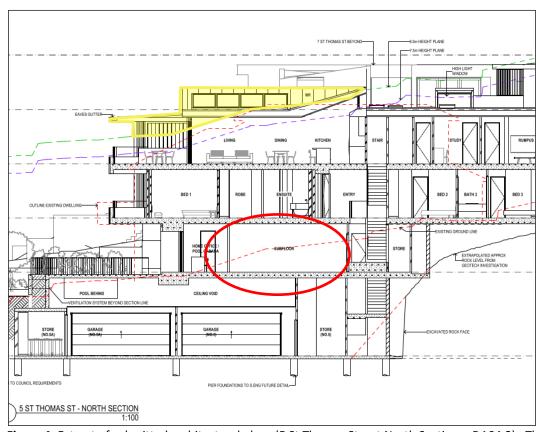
Extract of submitted architectural plans (5 St Thomas Street North Section – DA04.2). The area shaded yellow represents the height of building non-compliance. The area outlined in red shows that the 'subfloor' should be counted as GFA.
